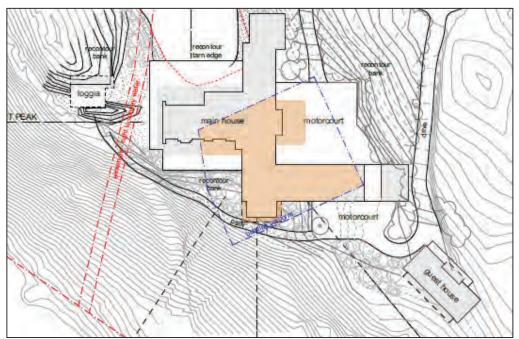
Proposed residential unit location plan (portion of building within the building platform shaded orange)
